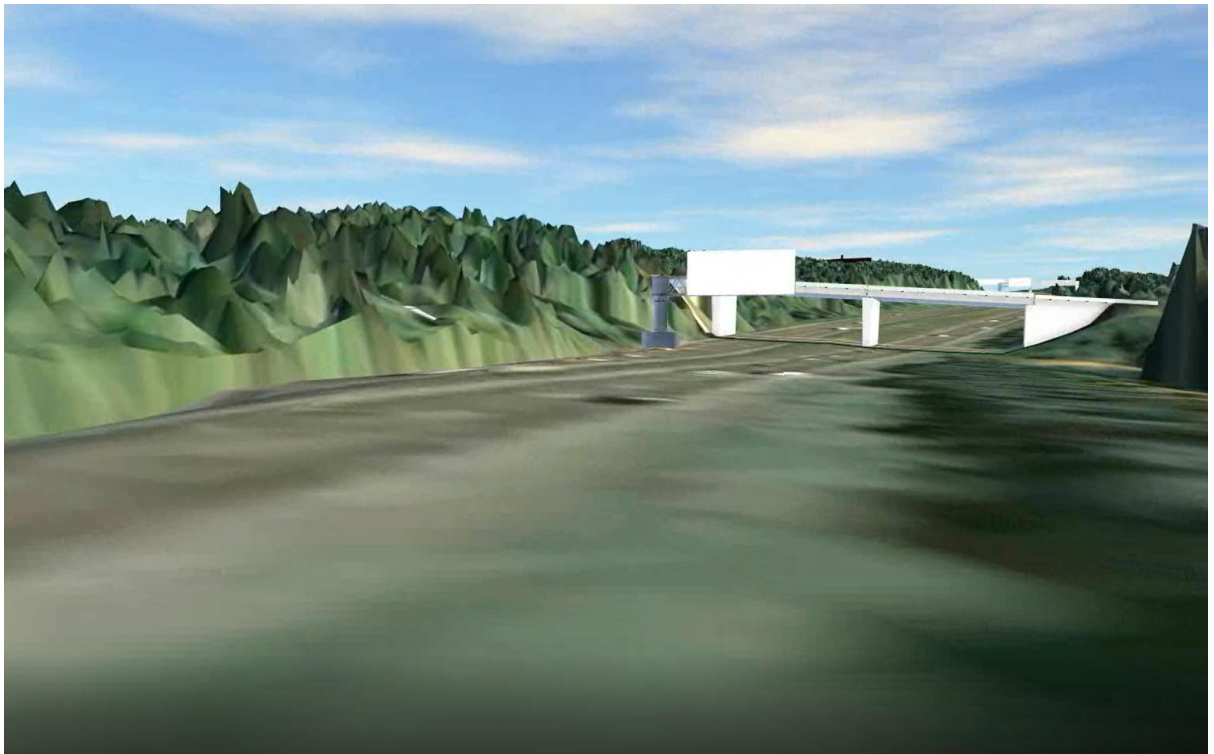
Approaching Smith Lane Bridge, the proposed cantilever gantry would combine with the bridge as the Angel of the North disappears further behind the woodland
